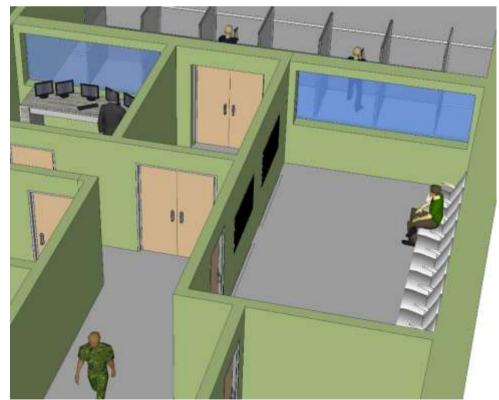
An example of a waiting room visualization with a bulletproof window providing an insight into the shooting hall
